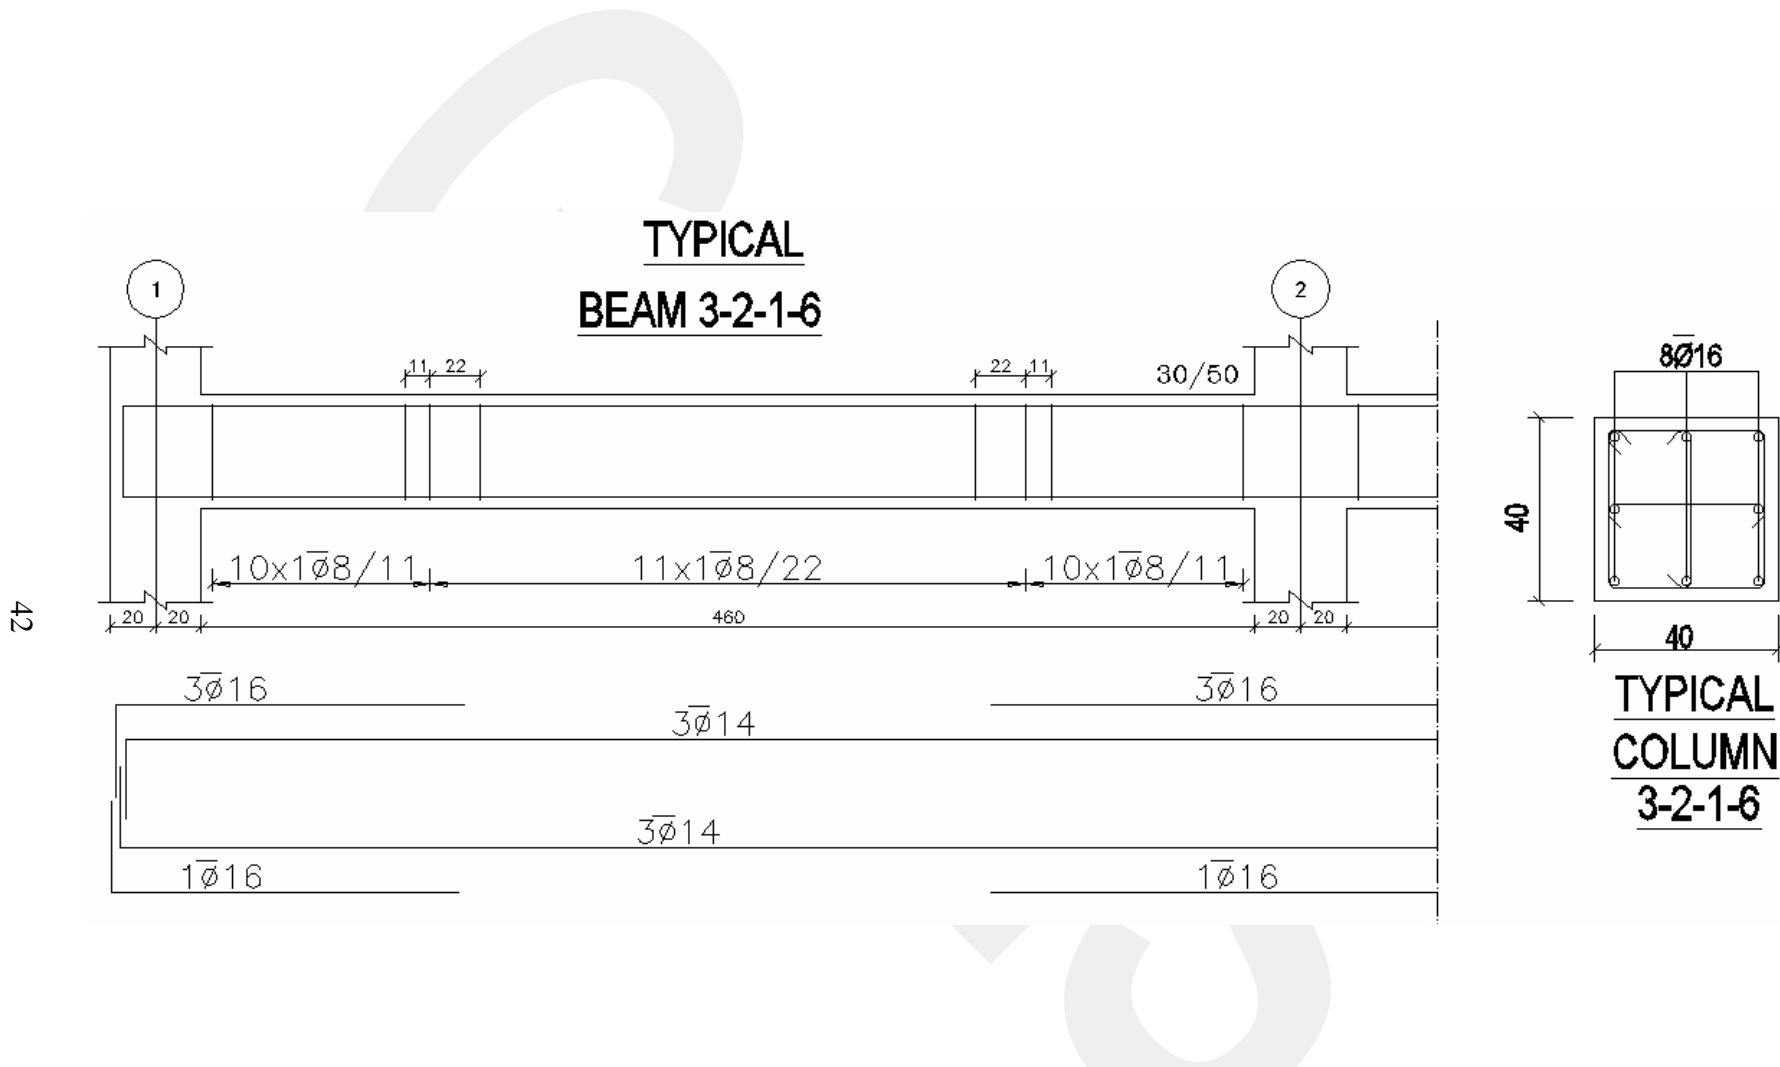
Beam and column reinforcement details of the model 3-2-1-6
